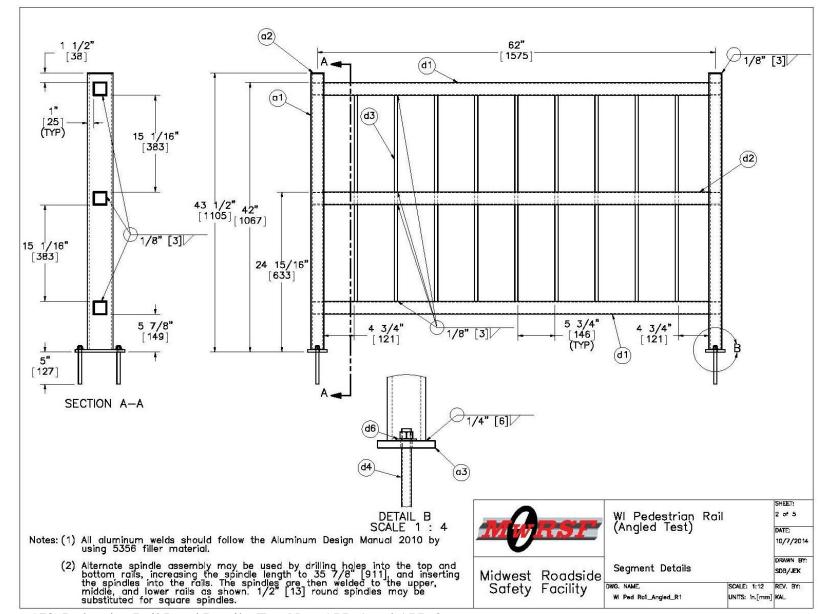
Pedestrian Rail Panel Details, Test Nos. APR-1 and APR-2
